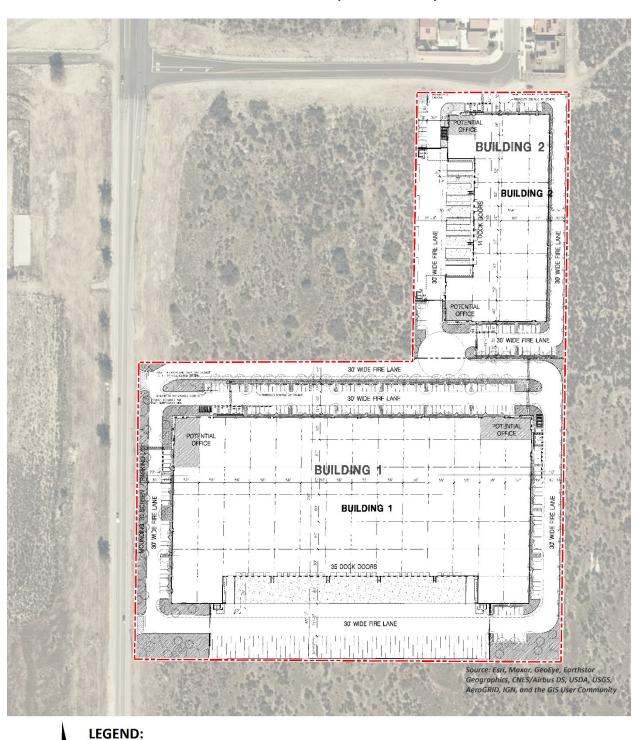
B: SITE PLAN (ACACIA PROJECT)
